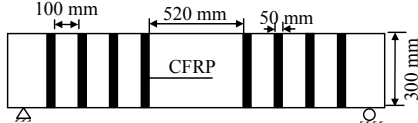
The arrangement of the CFRP laminate in retrofitted beams.
